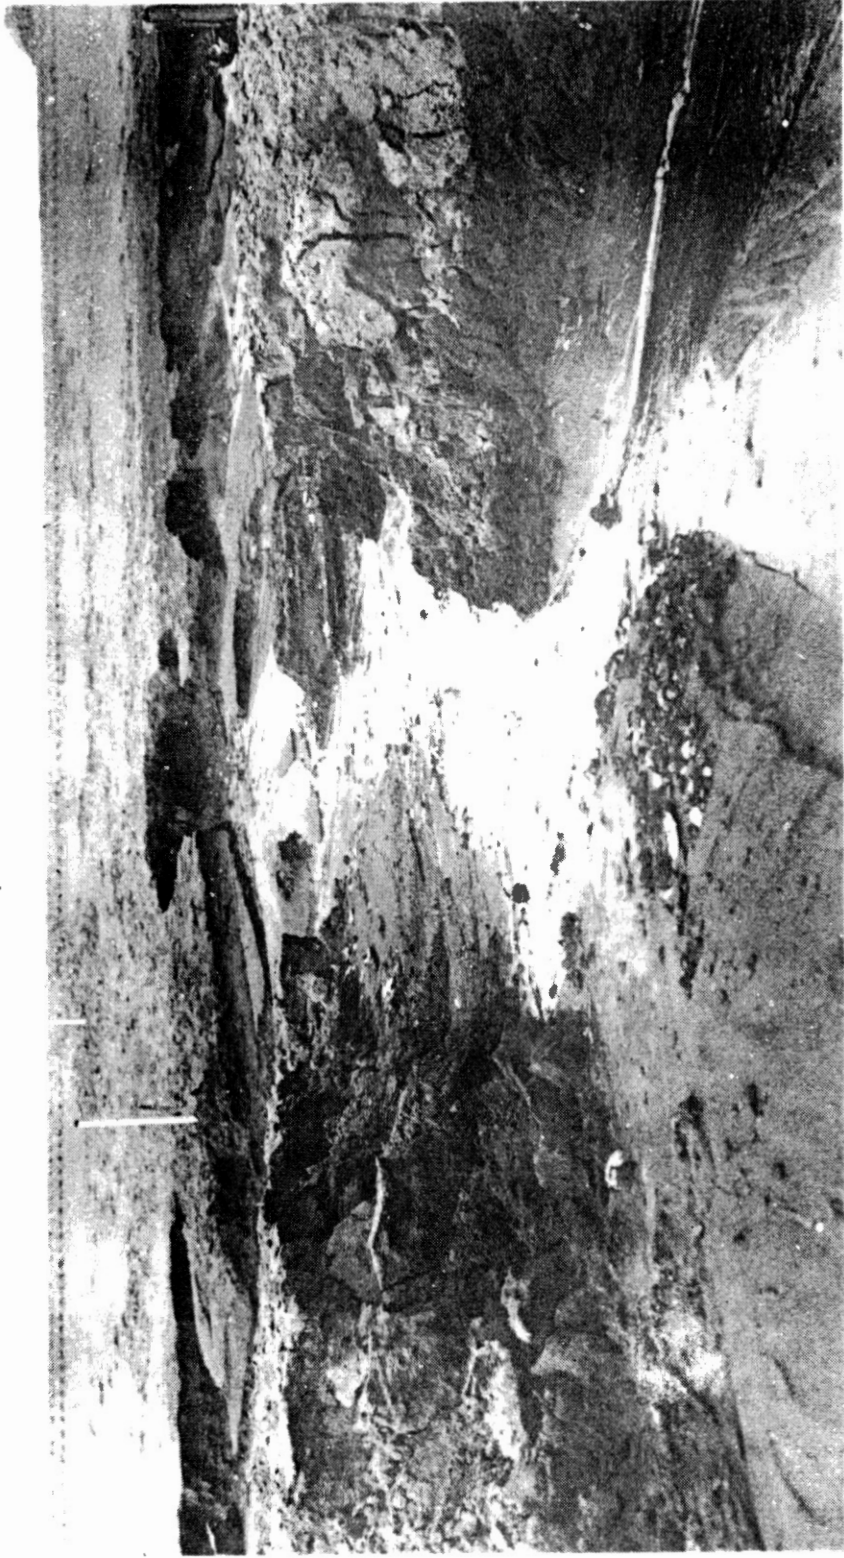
Landside Slope Erosion at Drury Test Section No. 4.
